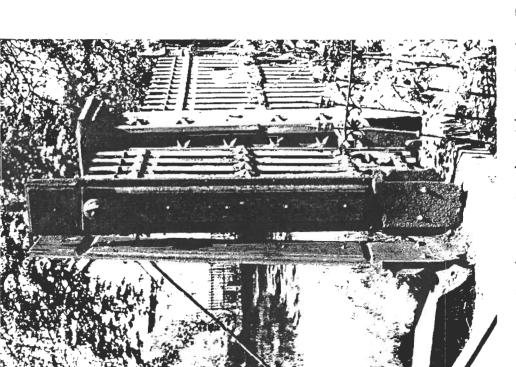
Detail at Base of Damaged Cast Iron Fence Columns (South Gate).
